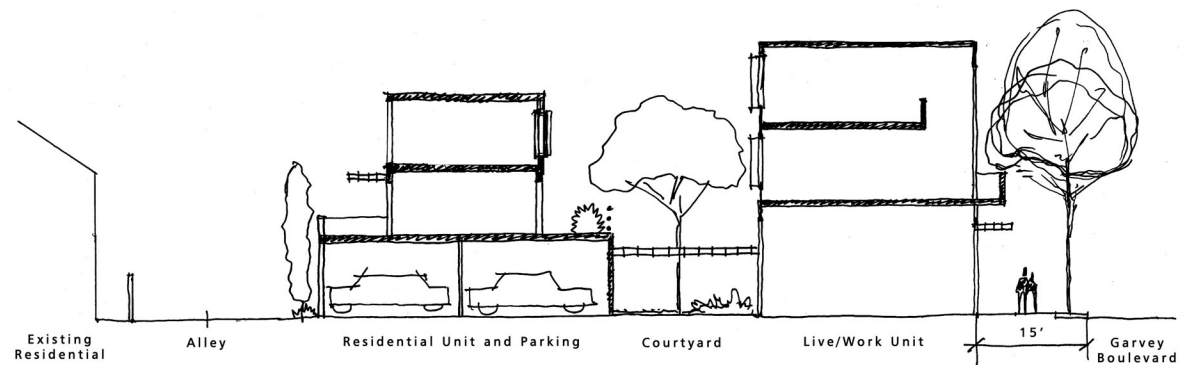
Cross-section through mixed-use concept for East Garvey.
